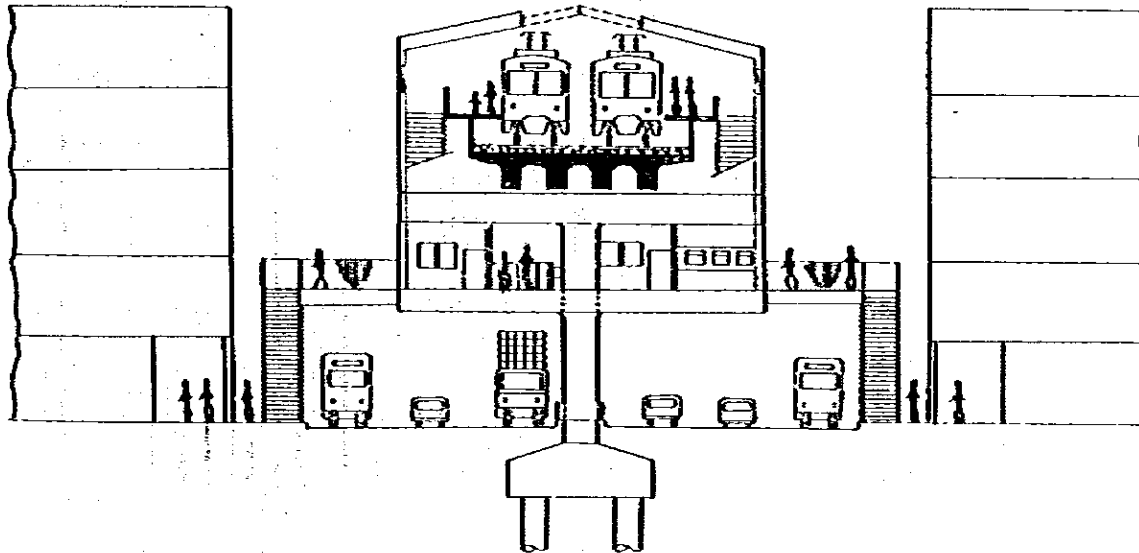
TYPICAL CROSS SECTION (Urban railway)
